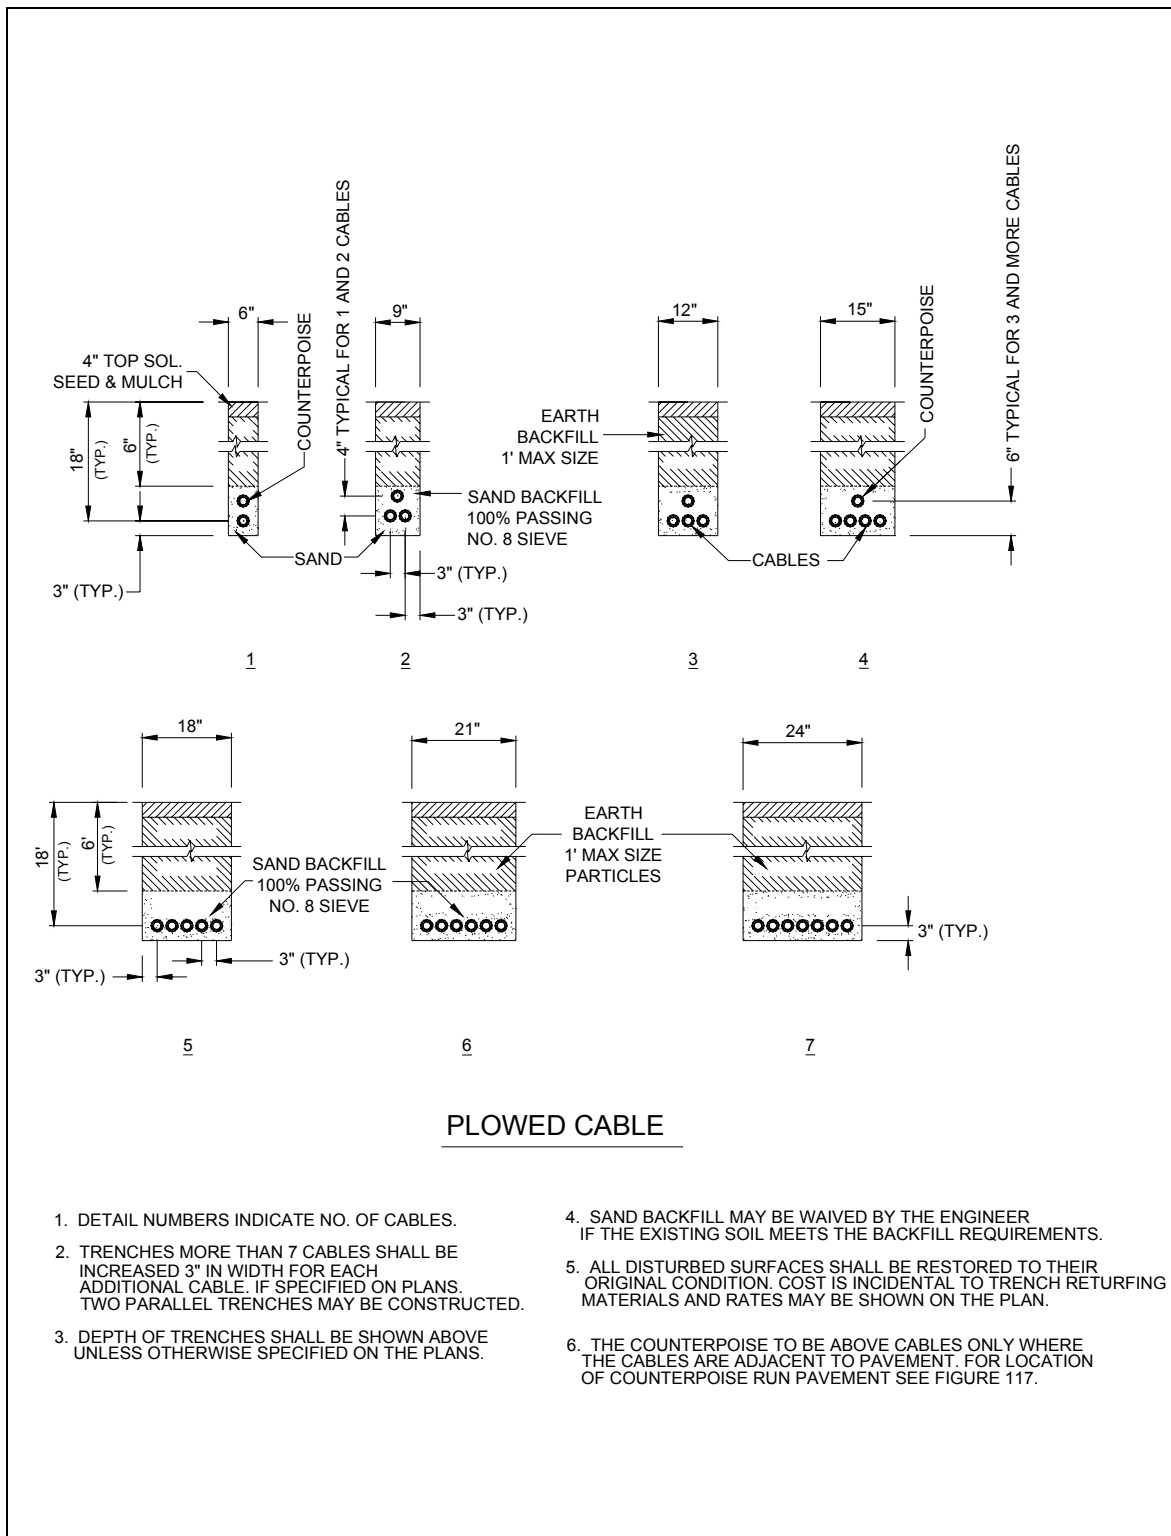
Standard Details for Underground Cable Installation – GL-600 Sheet 2H – Plowed Cable
